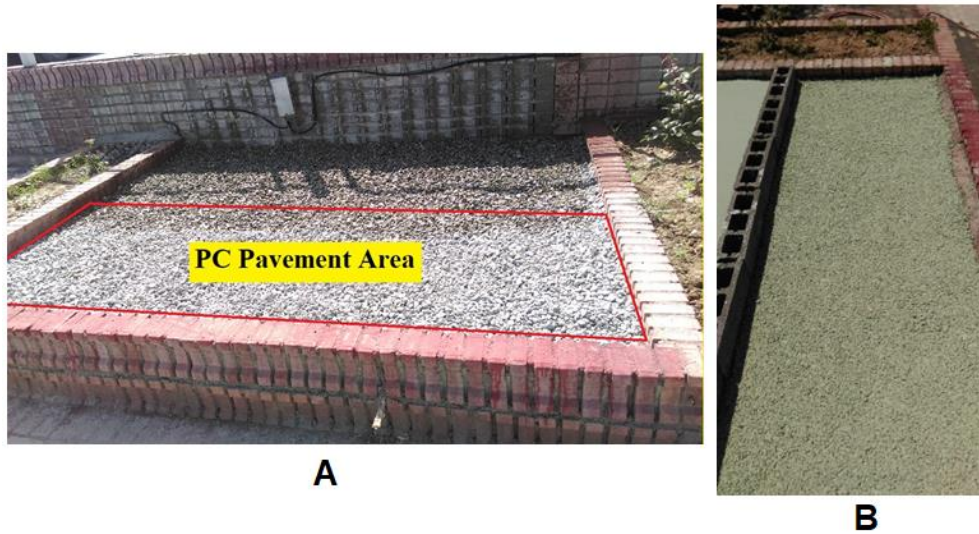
A layer with 0.20 m thick coarse aggregate beneath the PC pavement (A) and constructed PC pavement (B).
